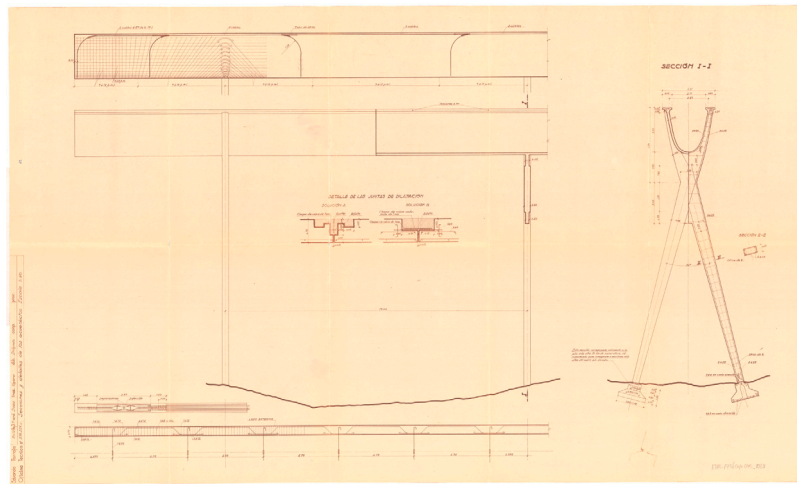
Drawing containing of typical sections, elevations, and details of the Allos aqueducts by Eduardo Torroja Oficina Técnica.
